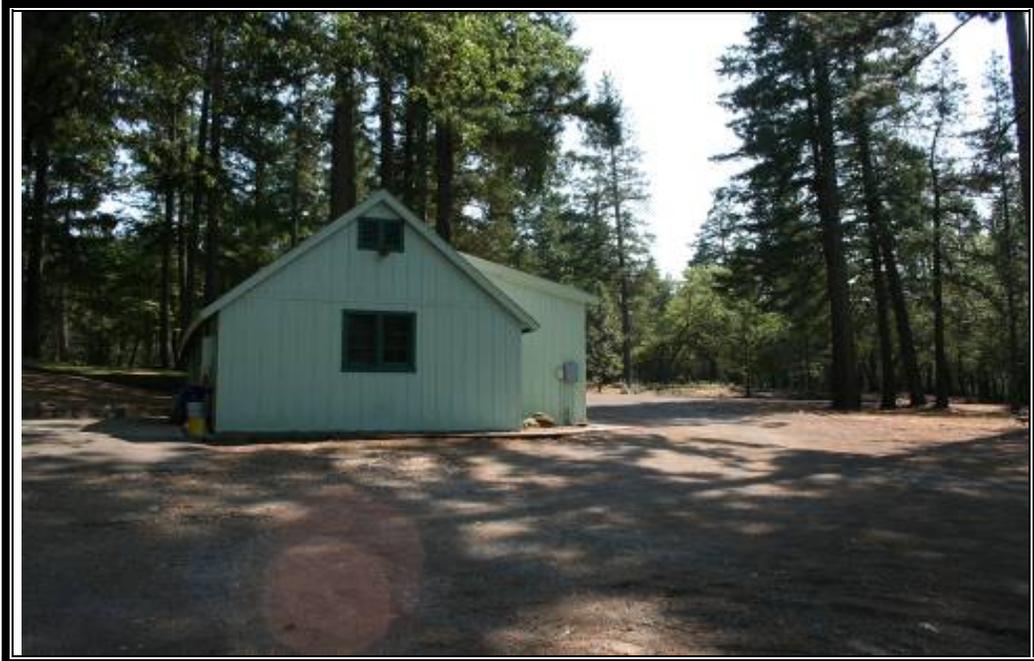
Same view of the truck garage building as it looks today with the 1950's addition.
